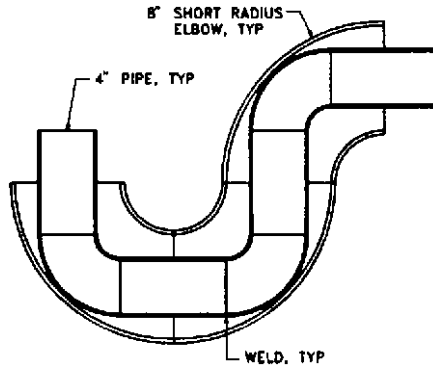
Typical double containment P-trap where the system uses metallic or thermoplastic butt welding/fusion pattern pressure fittings as the basis to fabricate a non-plumbing-code approved drainage system.
